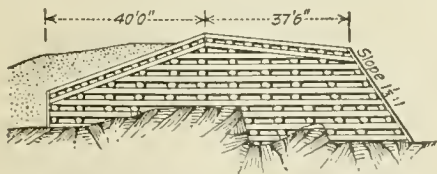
CROSS-SECTION OF TIMBER AND STONE DAM,
